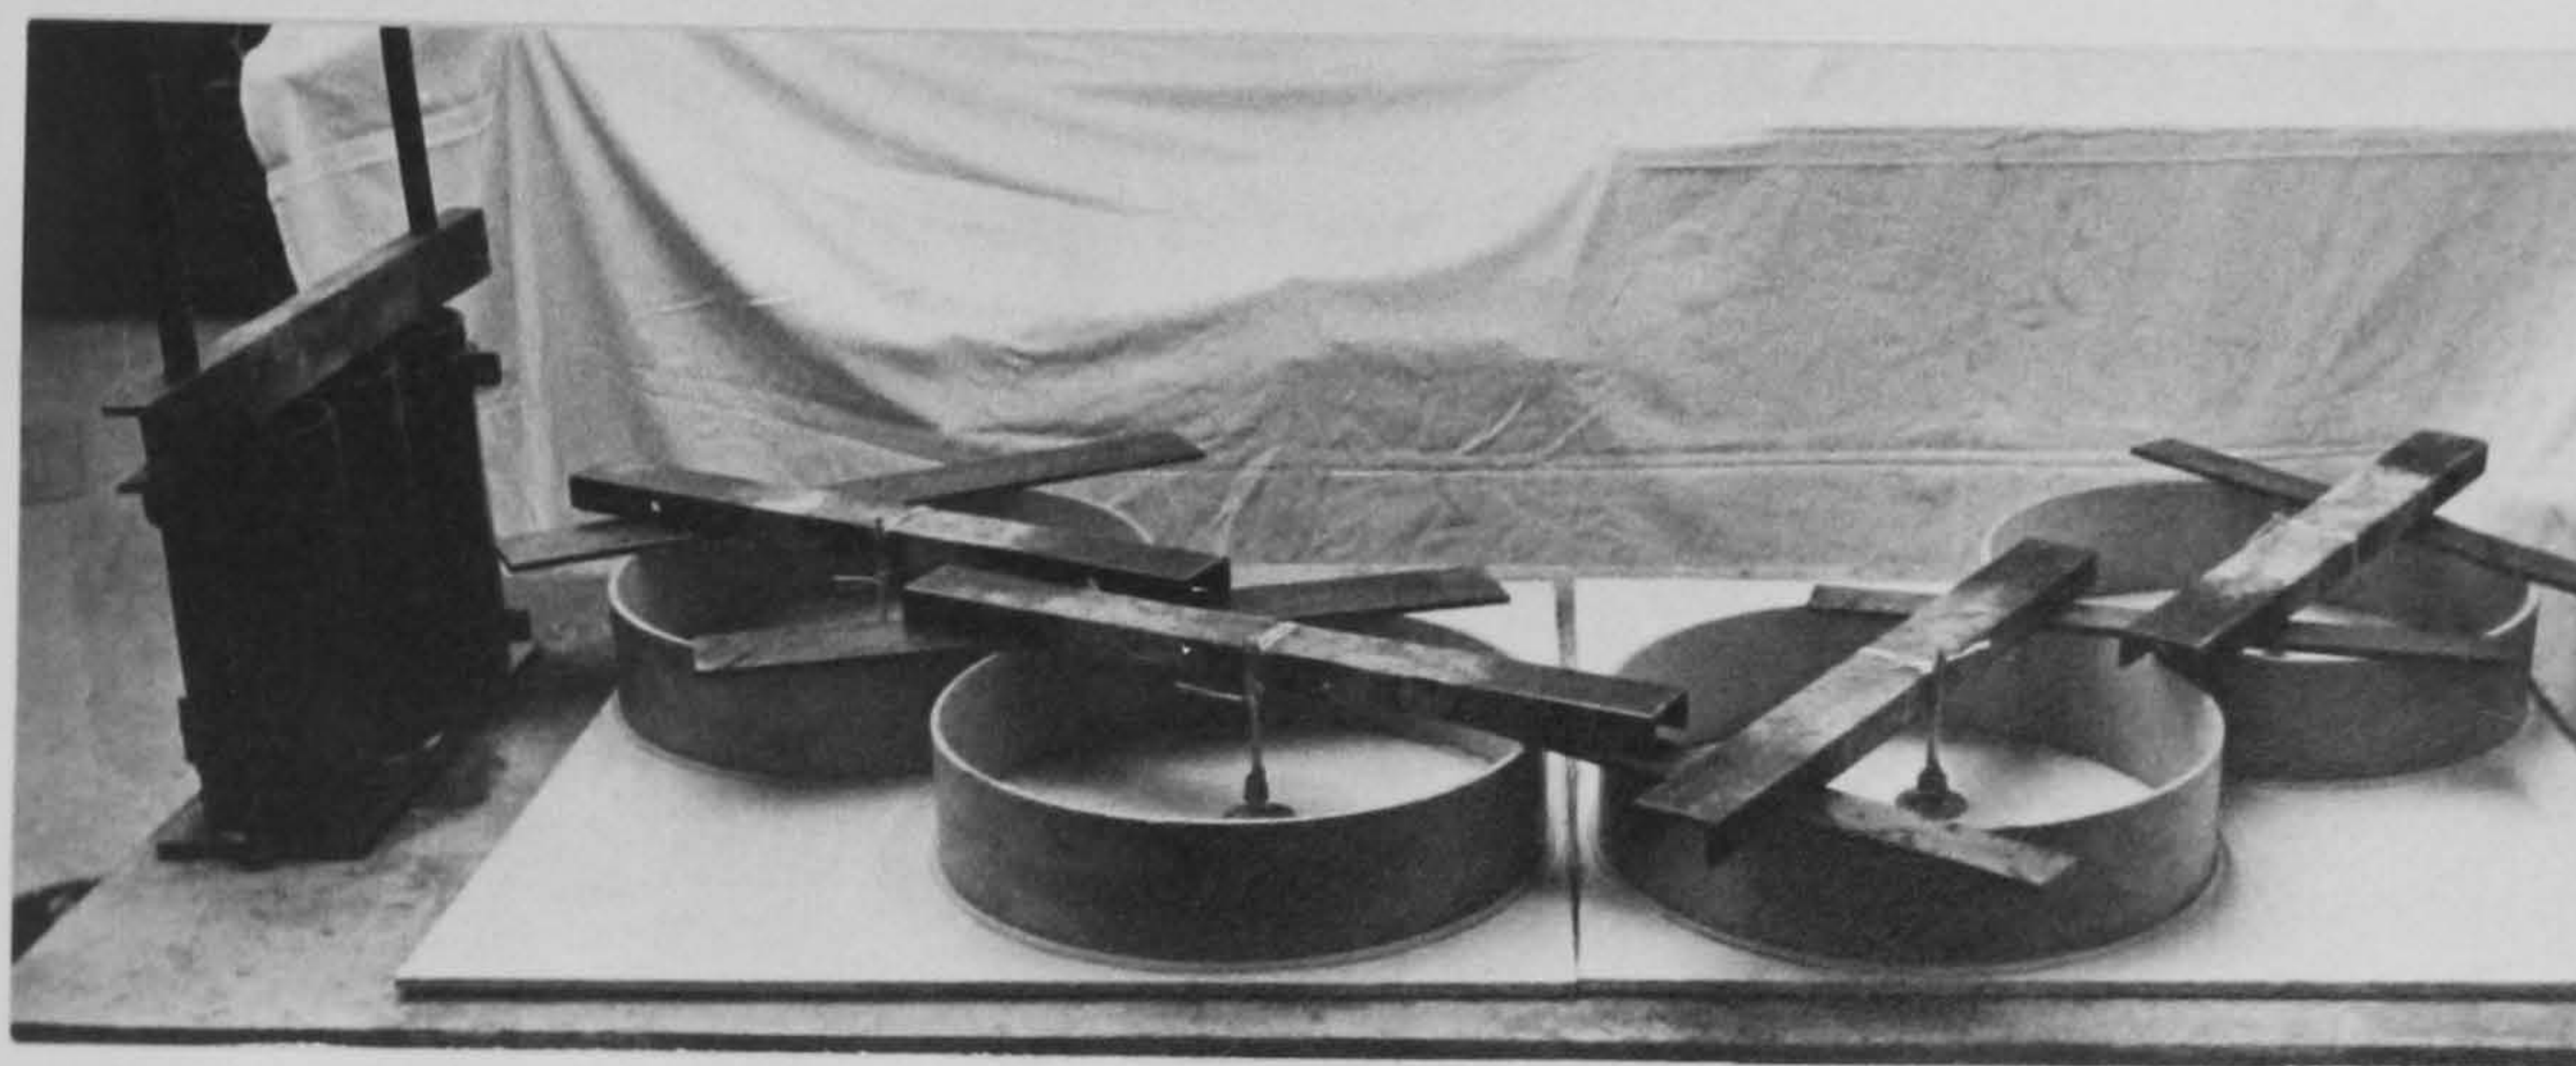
CARDBOARD MOULDS ON VIBRATING TABLE
